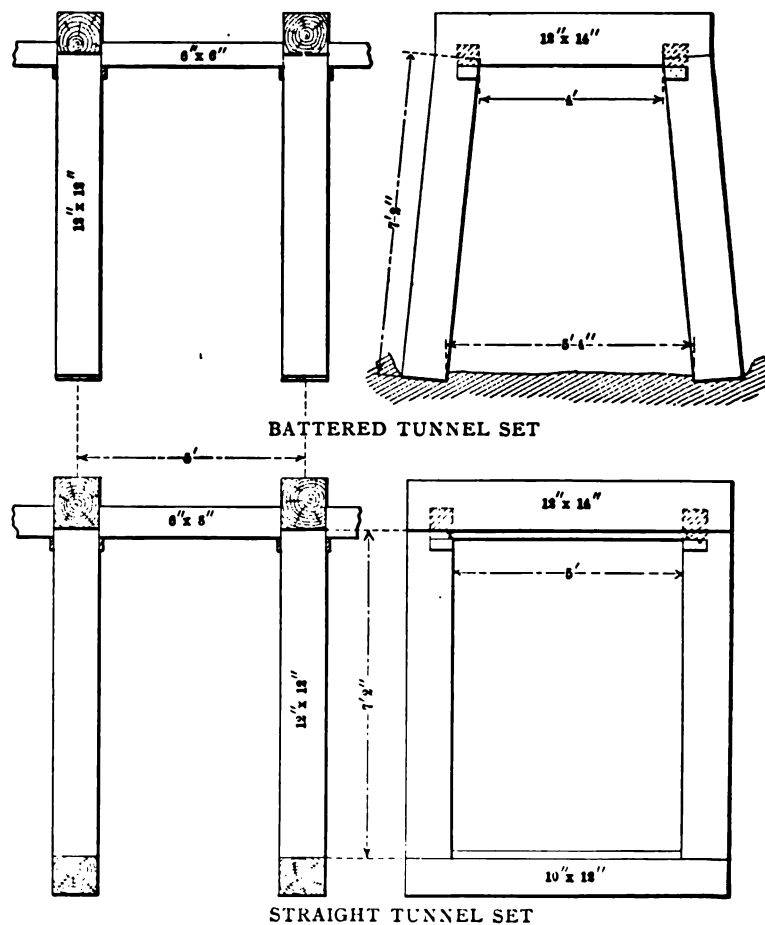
BATTERED AND STRAIGHT TUNNEL SETS.
